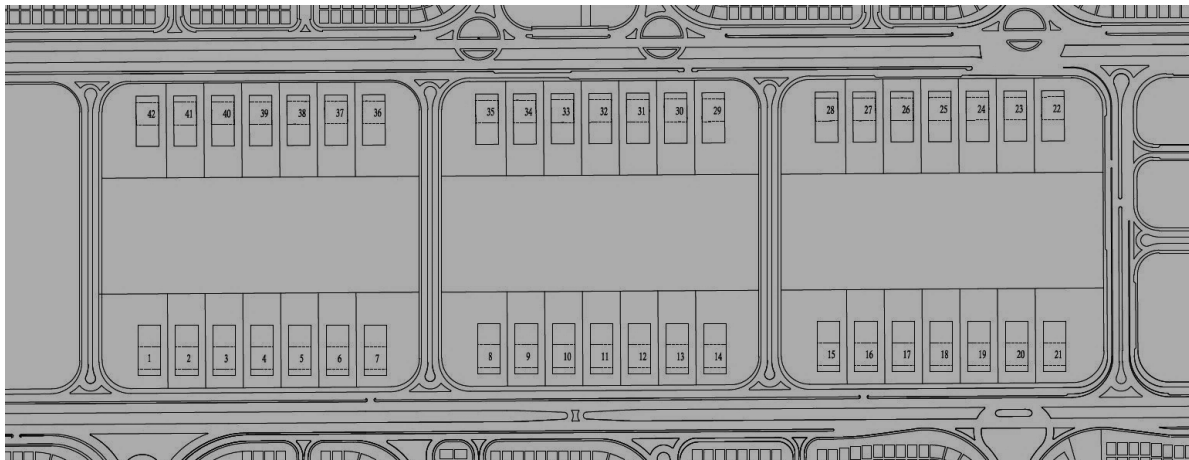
New Cairo proposed sites in design studio towers 2015. Authors, 2021.
